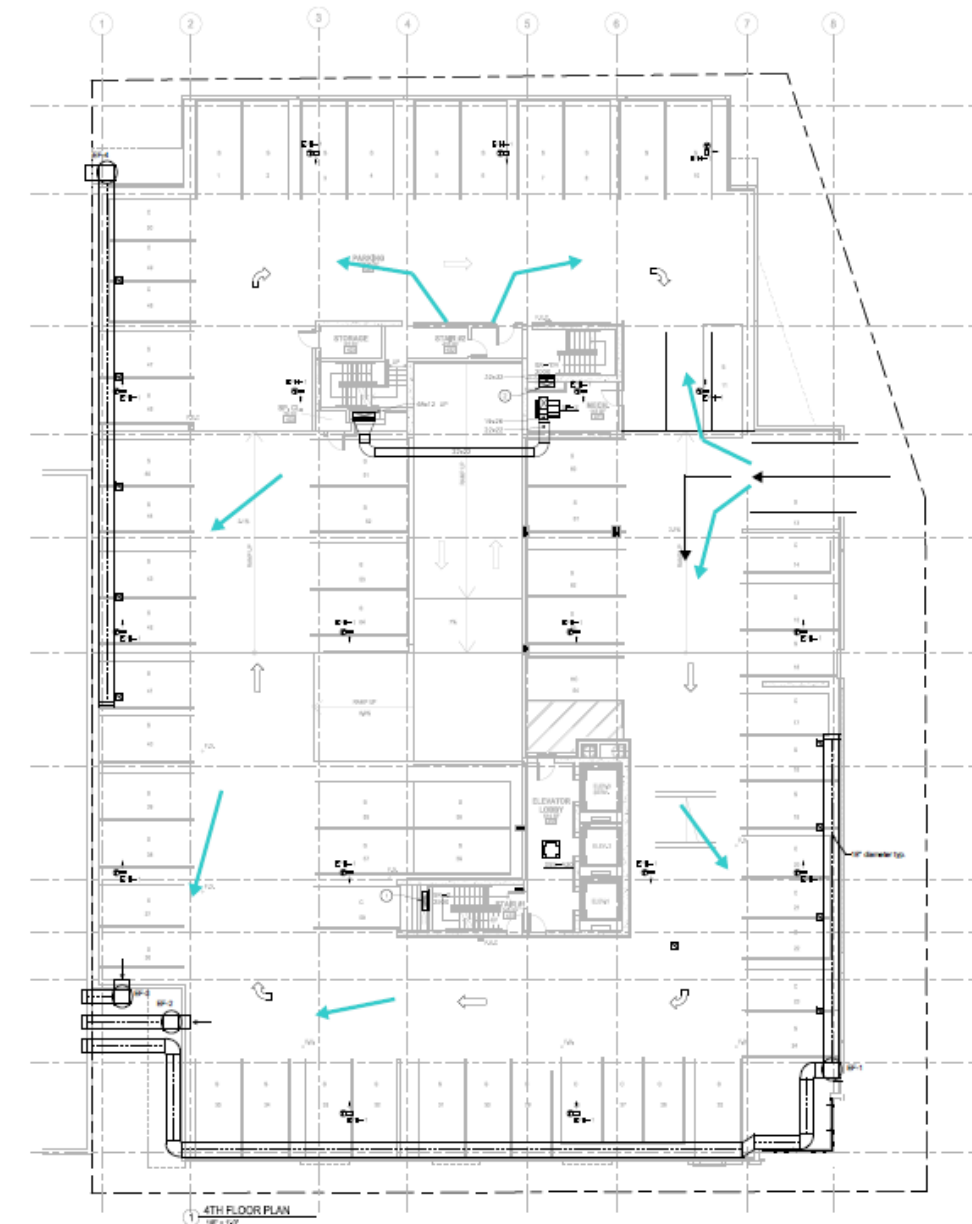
New Mechanical Design superimposed on existing parking garage layout
